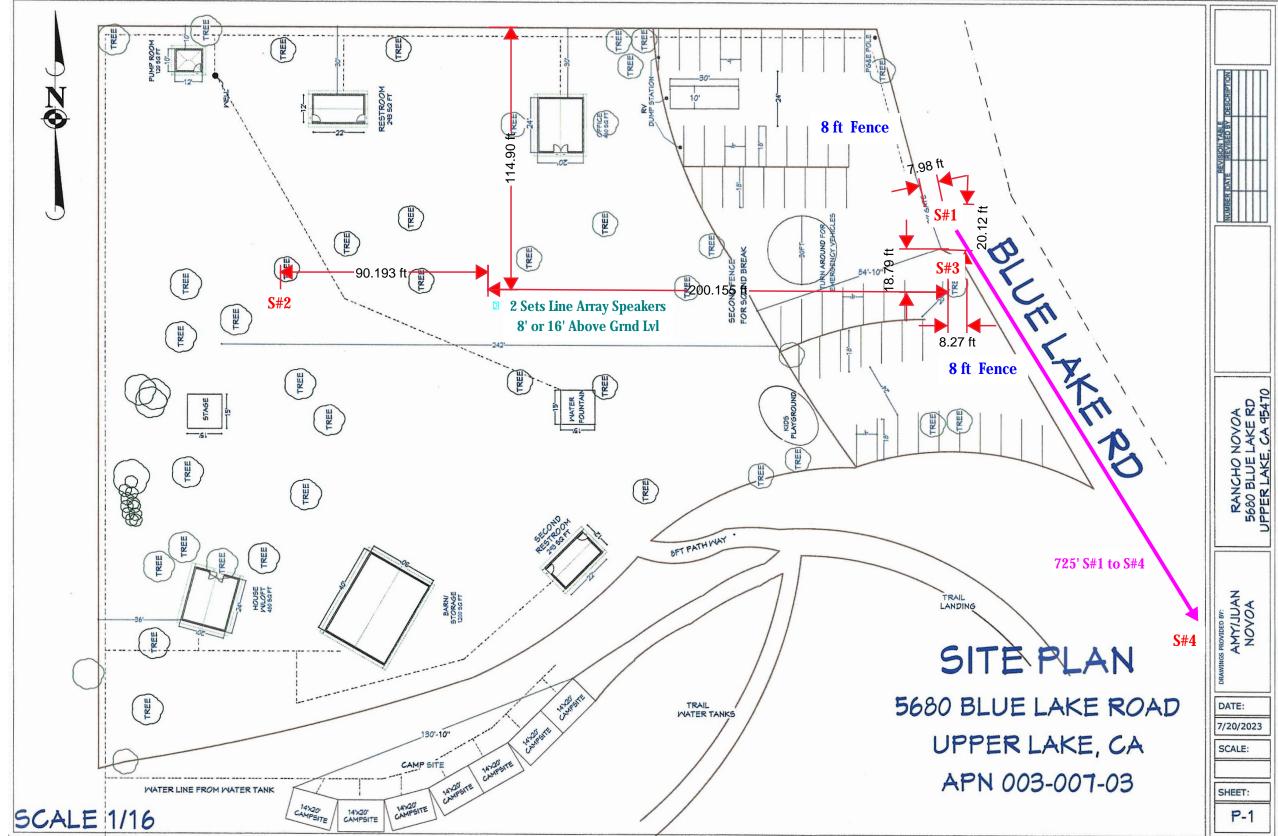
Architectural Site Plan with the Proposed Layout of All Facilities & Showing the Location of the Speakers and Field Sound Test Positions & Sound Monitoring.
